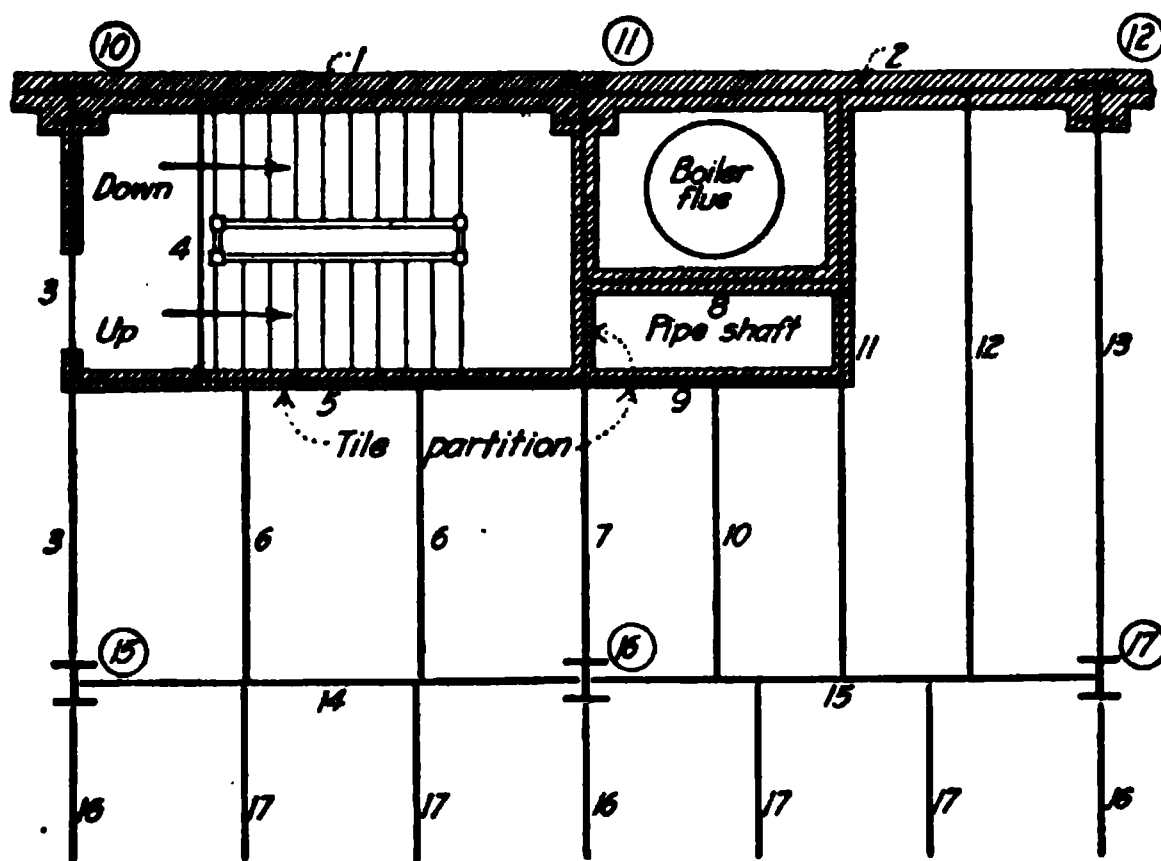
Framing around stairwell, chimney, and pipe shaft.
